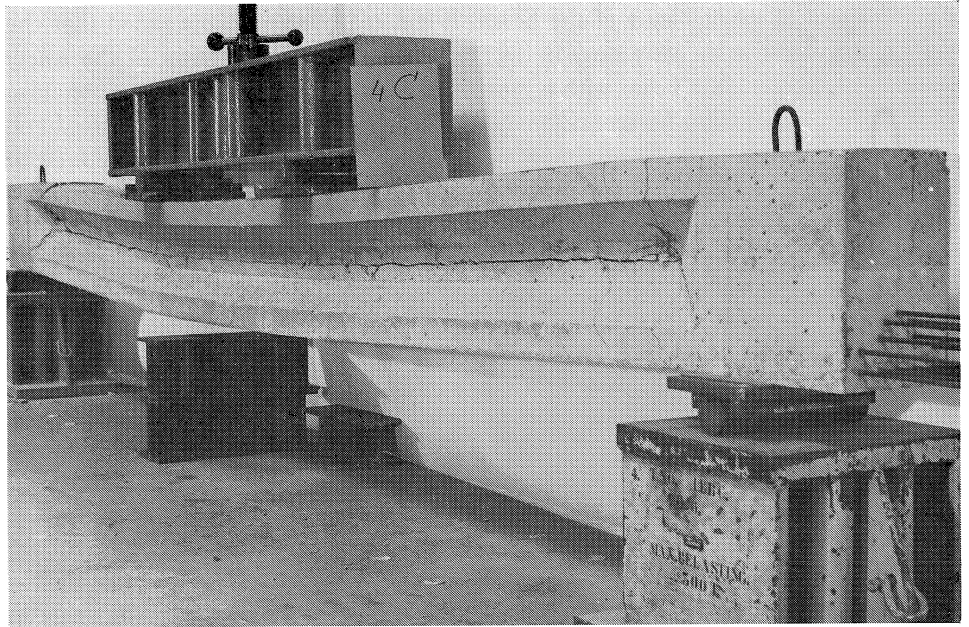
Testing a model beam (beam 4C) with artificial horizontal crack to failure at normal temperature (see also Figs. 3 and 13).
